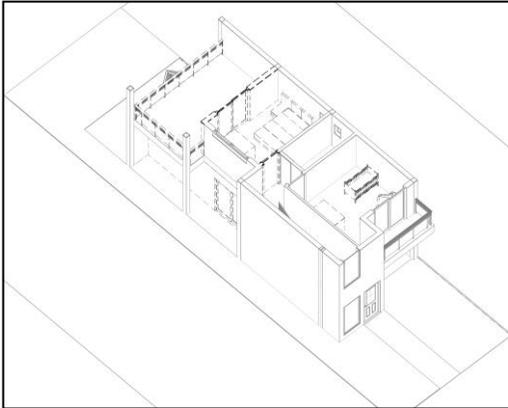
First floor 3D plan in stage two – dashed lines show demolished elements
